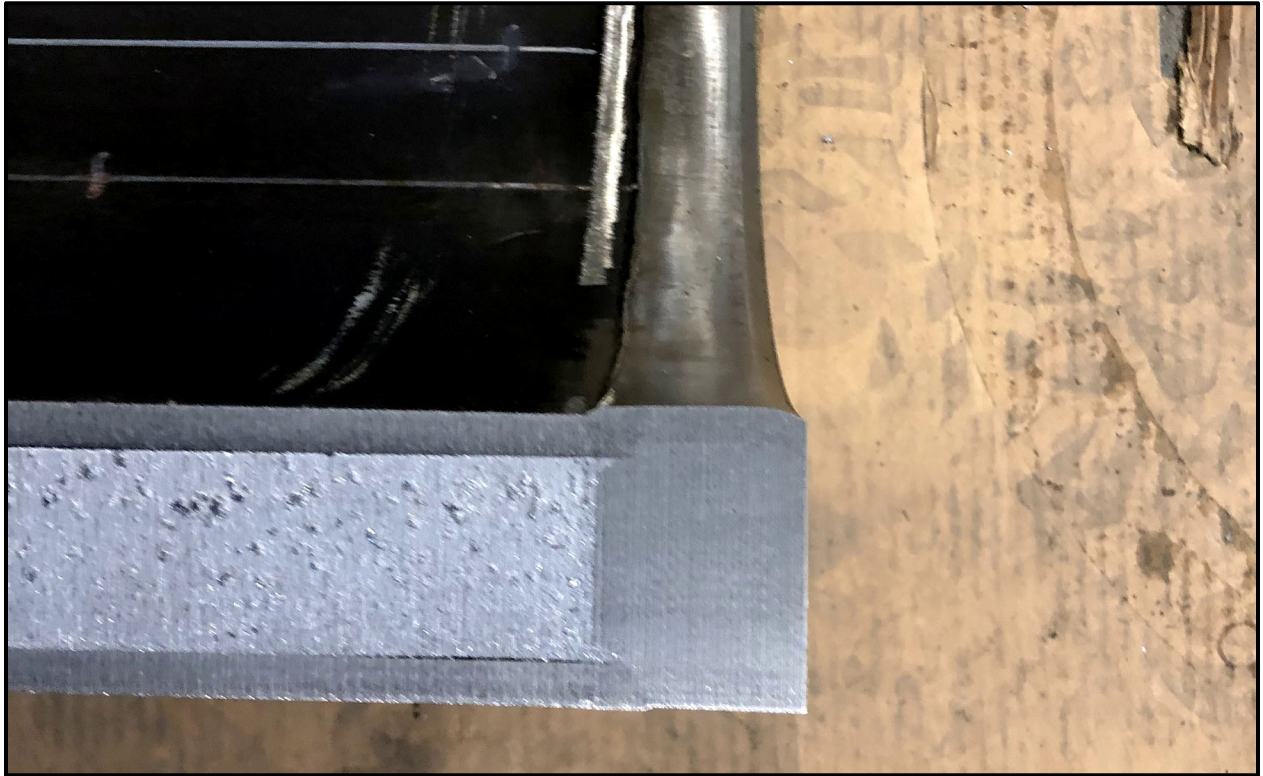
SC-30G2 18TU-01 Destructive Disassembly Cut A at Upper Flange
